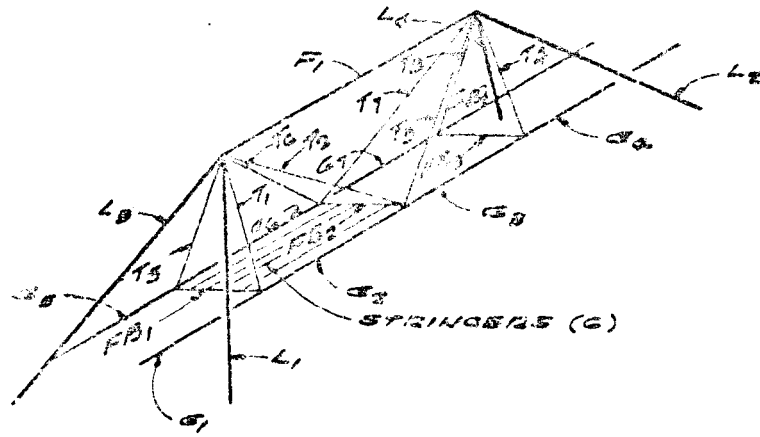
BRIDGE CONCEPT NO. 6: FRAME BRIDGE
